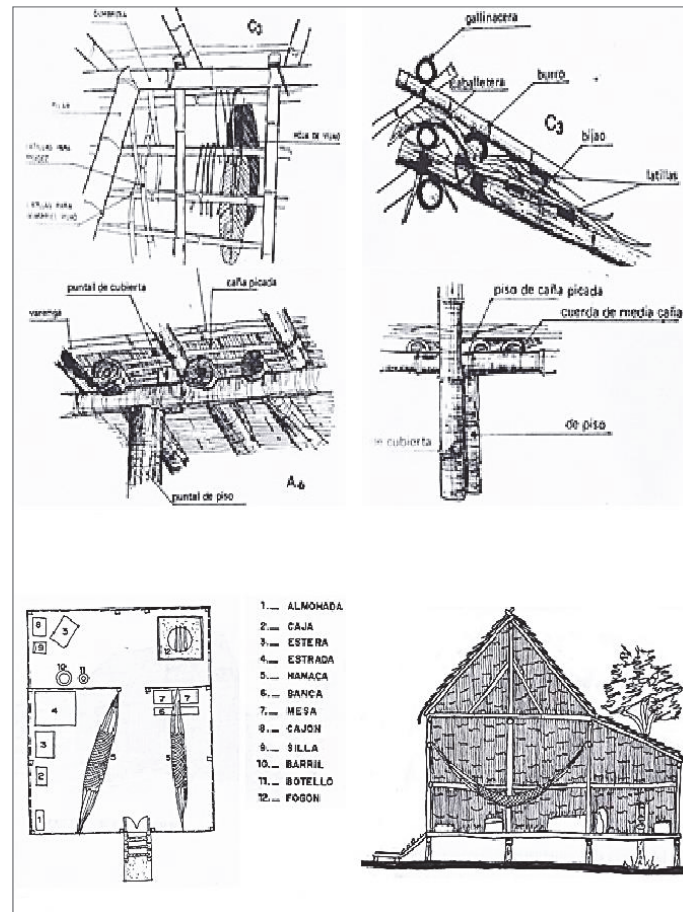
Traditional wood and bamboo house (Source: Sainz & Camino, 2014, p. 138)
